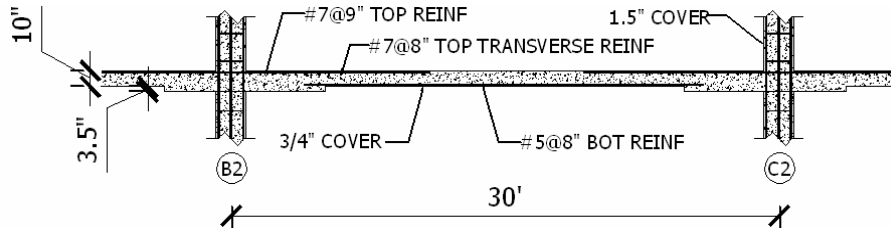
Sample Slab/Drop/Column Section along Column Line 2
